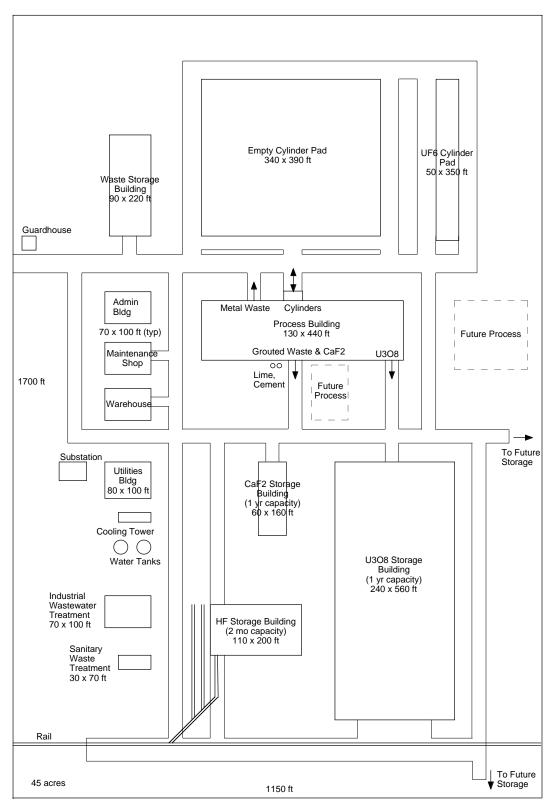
Facility Site Plan Conversion to U3O8 and AHF (15 yr)
